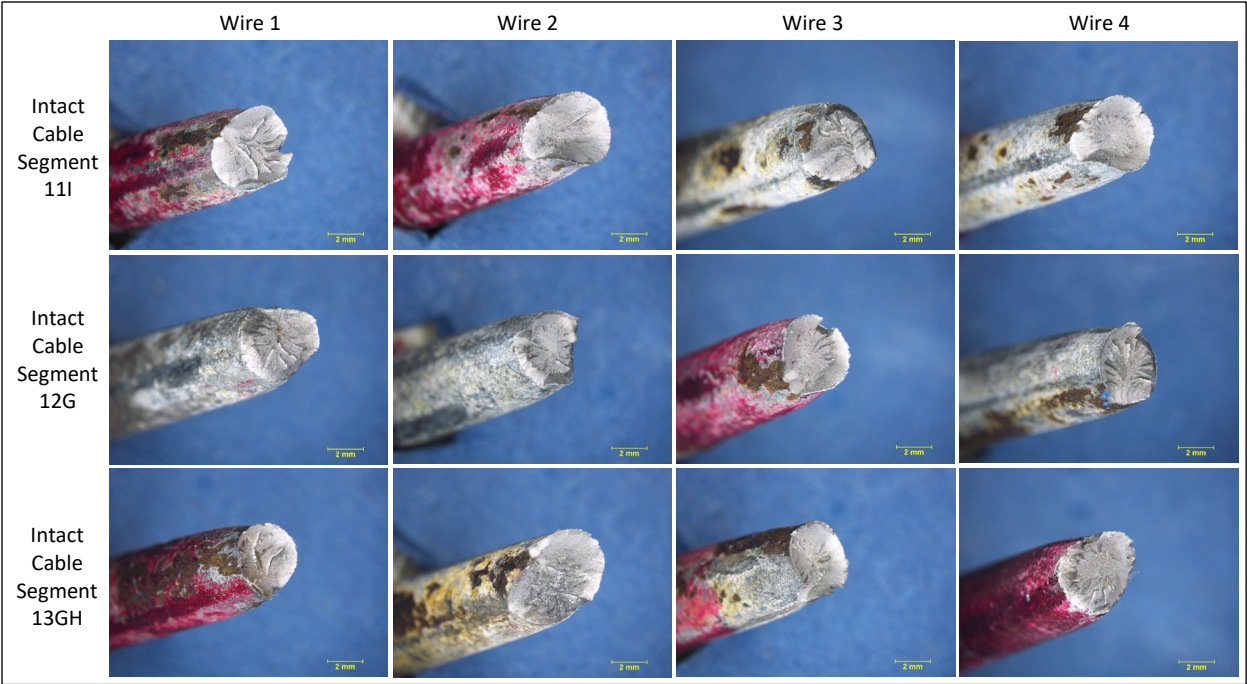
Fracture surfaces after wire tensile tests (photos: Socotec).
